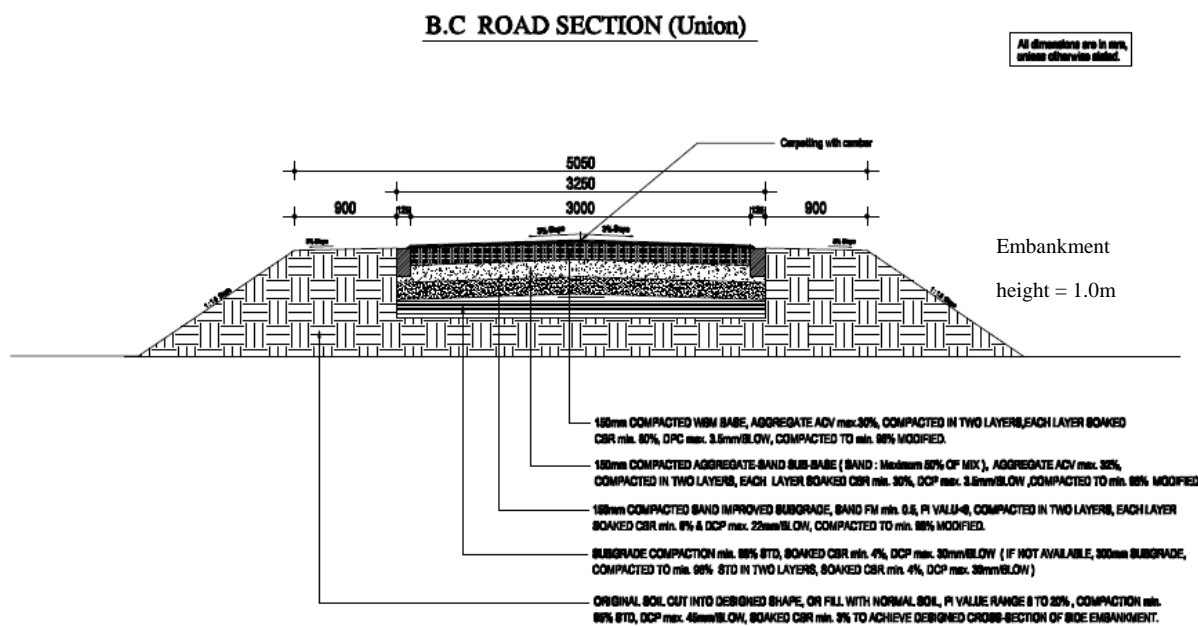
B.C Road Section (Non-submerged) (Union Road)
